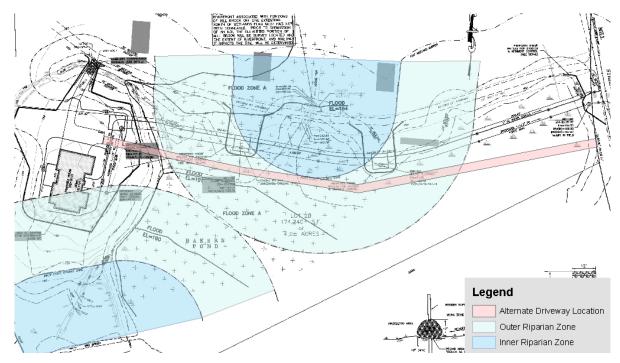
Impacts to Riverfront Area associated with the alternative construction of a new driveway.
